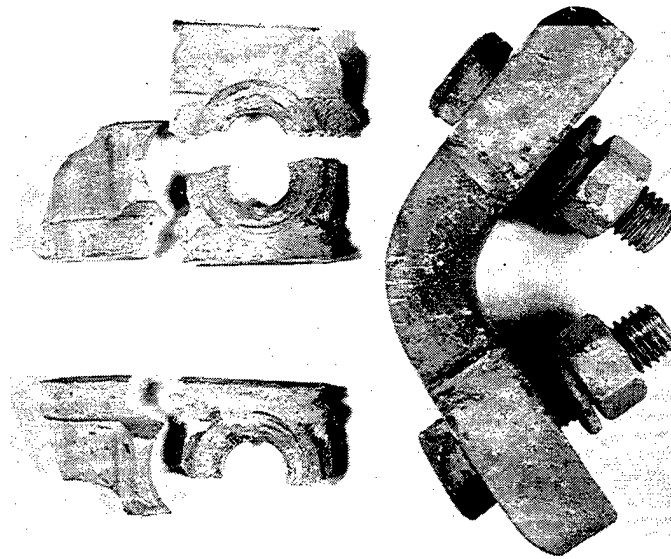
Broken pieces from the bolt holes at the oblong hole in the deck panel plus the bent lifting bar as the result of the pull test. Although not clearly seen in the photograph, discolored areas were observed in the fractured surfaces of the pieces.
